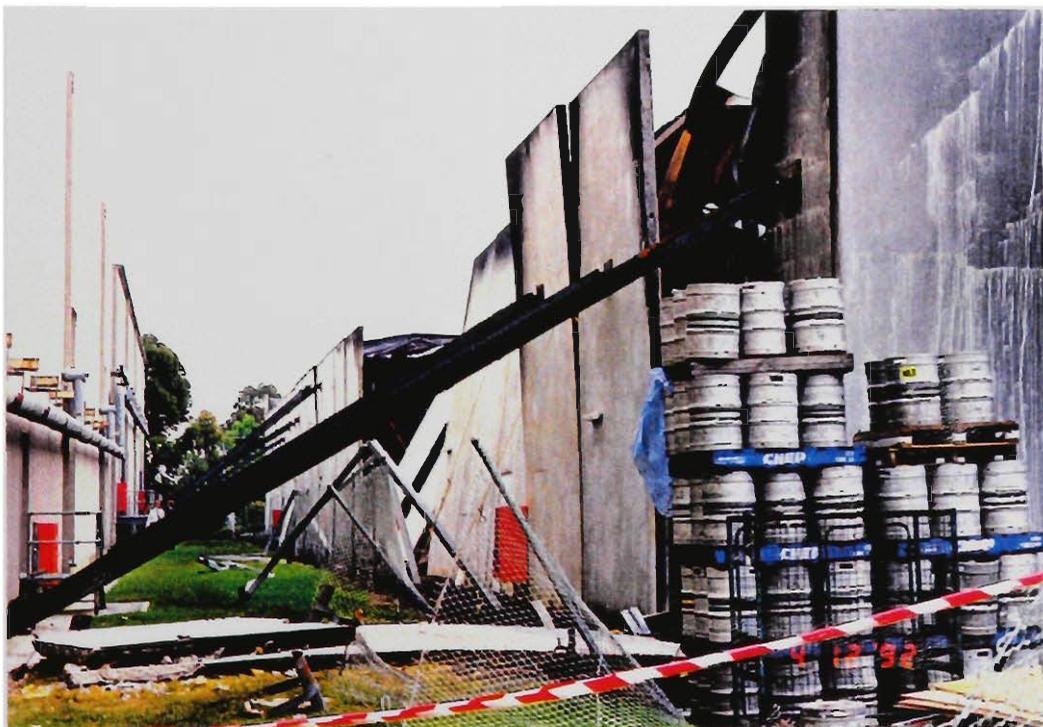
Case 1 - Mayne Nickless Storage Warehouse
